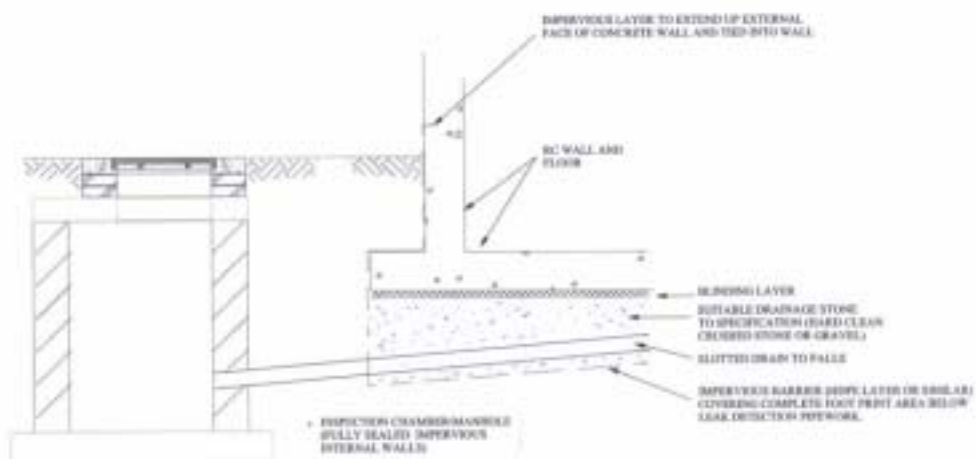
Section through sub-floor leak detection system at monitoring chamber
